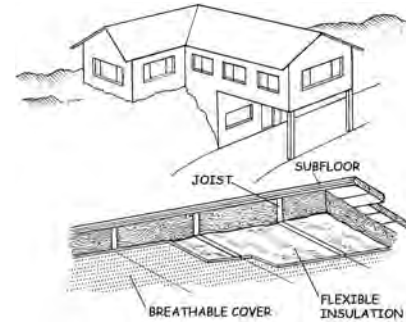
UNDERFLOOR INSULATION WHERE NO FOUNDATION WALL EXISTS
